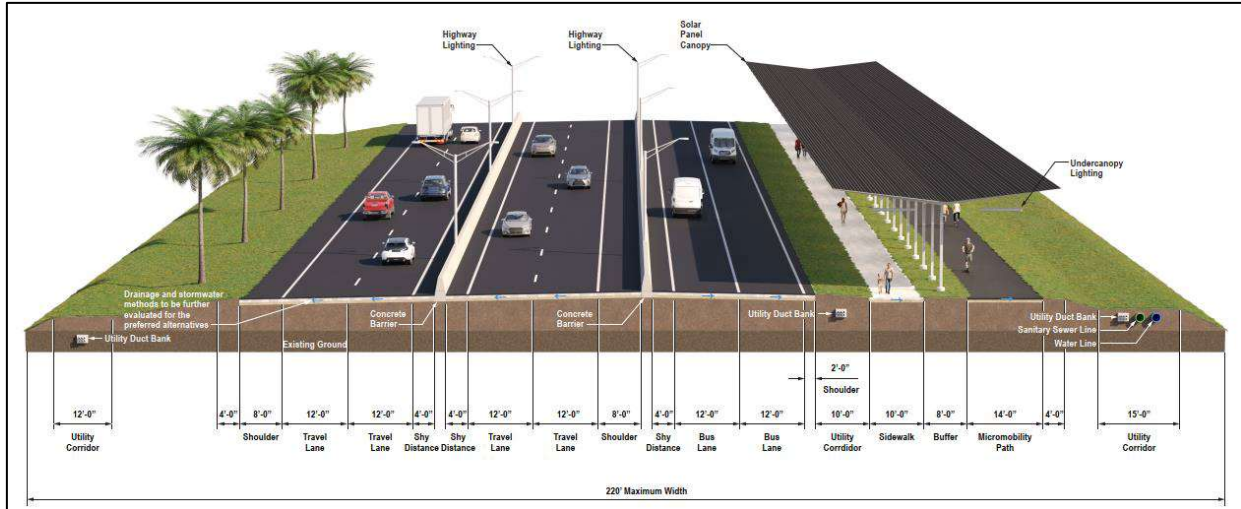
2074 Build Alternative Section 2 Cross-Section for all Alternatives and Section 3 Cross Section for B1, B2, and B3
